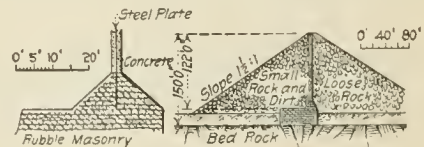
ROCK-FILL DAM WITH STEEL HEART-WALL OR DIAPHRAGM.
